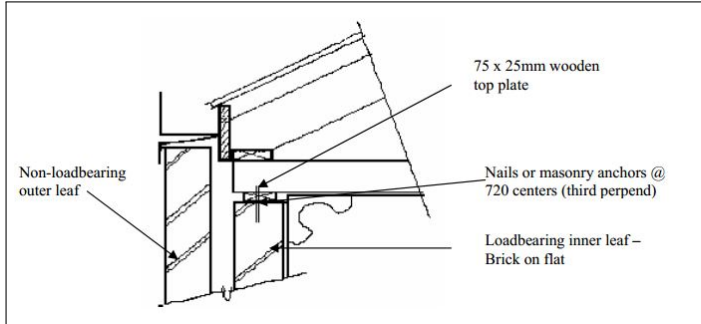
Cavity wall roof connection with inner wall as load-bearing
